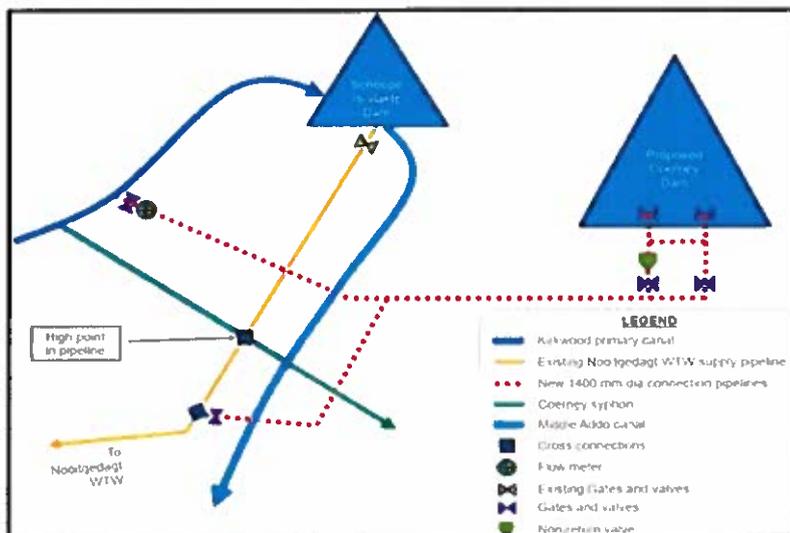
Proposed Schematic Layout of the Coerney Dam Project
